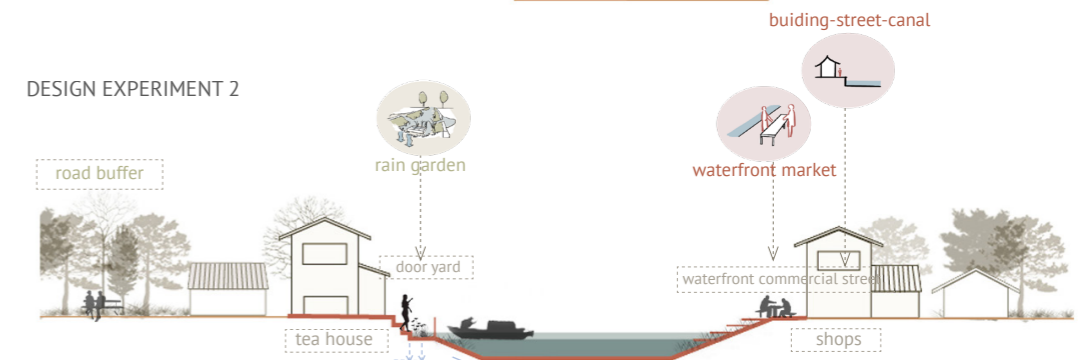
Section b-b' detail 2: experiment of widening the canal 2
